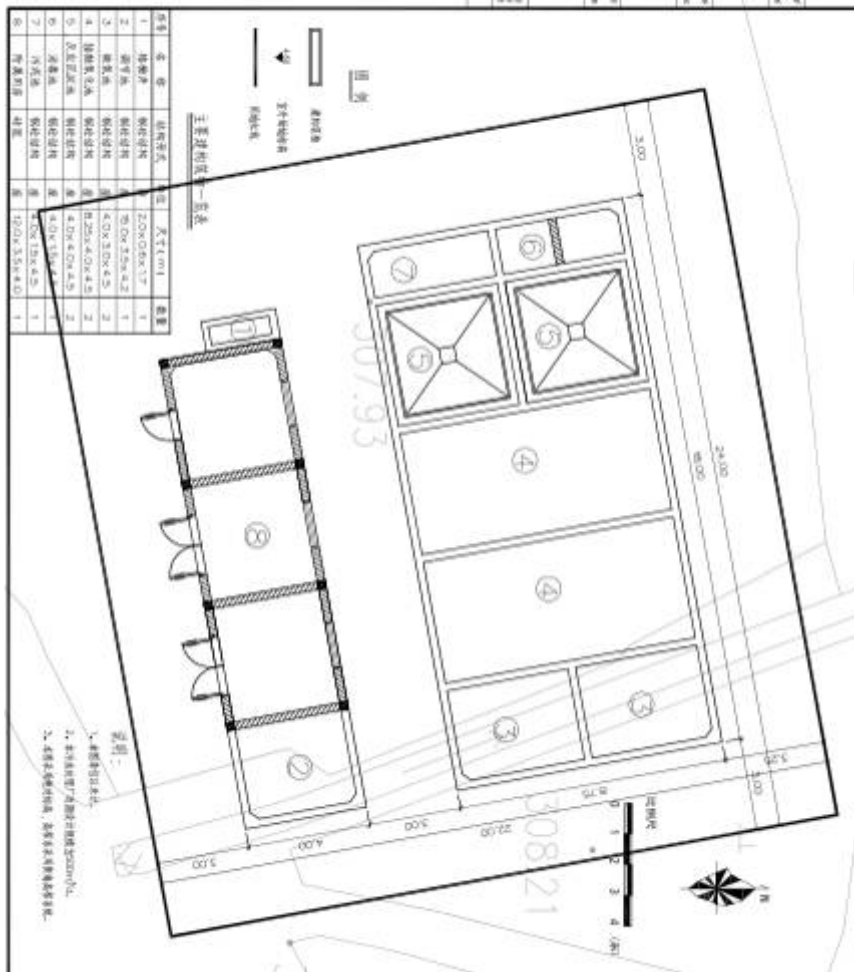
Layout Plan of Sewage Station of Lanju Town, Longquan City
